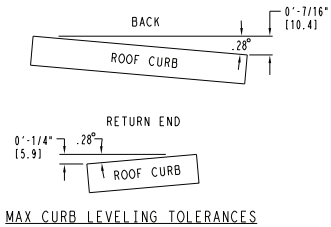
Roof Curb Details – 24 and 26 Size Units
